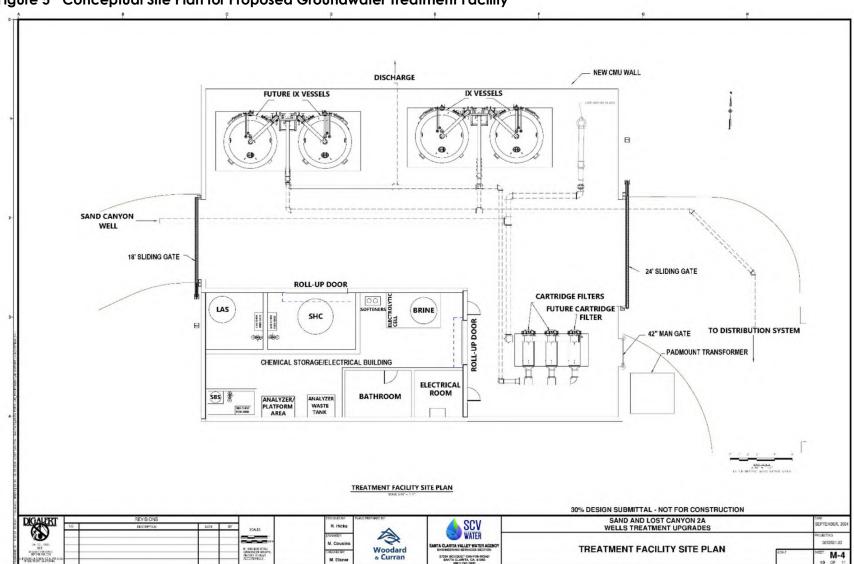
Conceptual Site Plan for Proposed Groundwater Treatment Facility
